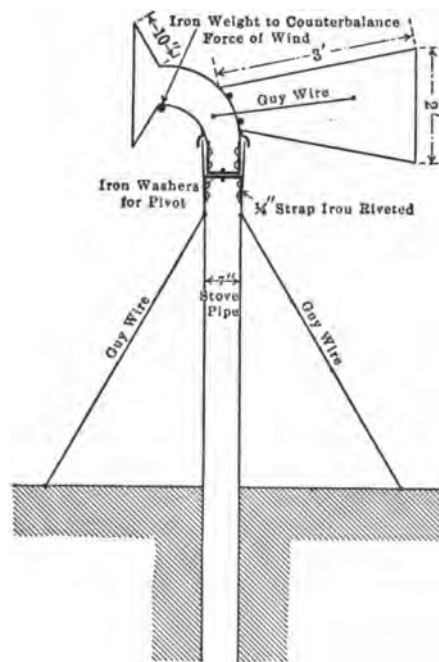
STOVE-PIPE VENTILATOR FOR DRILL HOLES.
